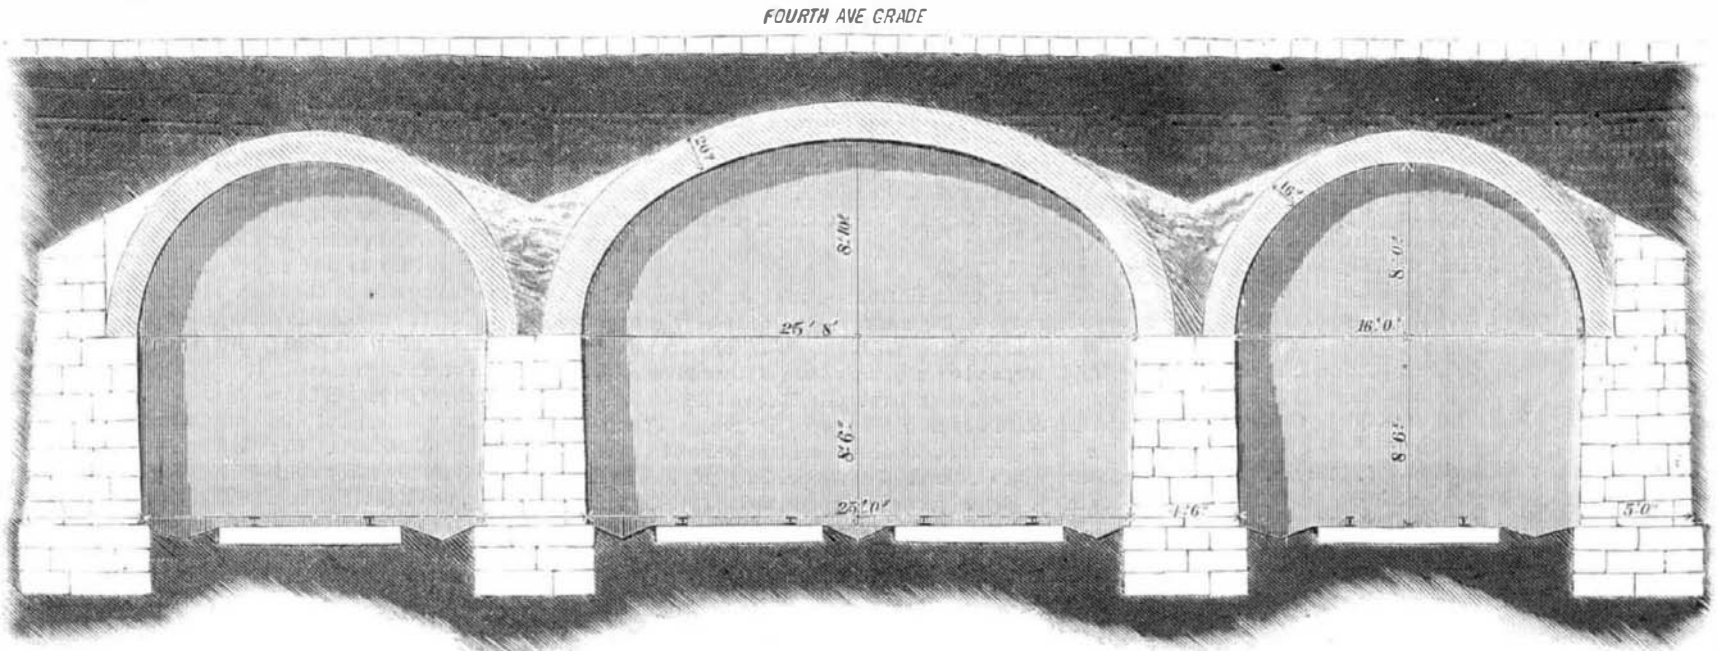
THE UNDERGROUND RAILWAY IN NEW YORK.—CROSS SECTIONS OF THE MASONRY TUNNELS.
